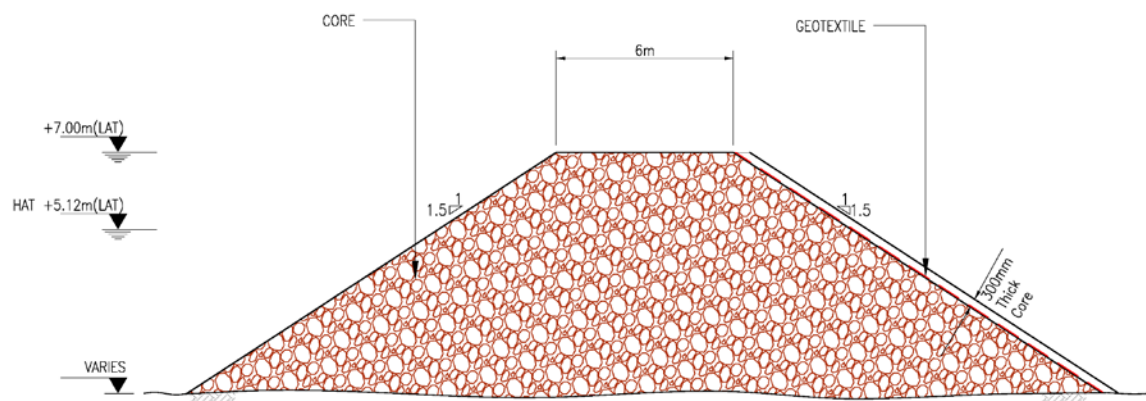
Western Basin Expansion typical section of bund wall core material and geotextile (bund wall type B2)
